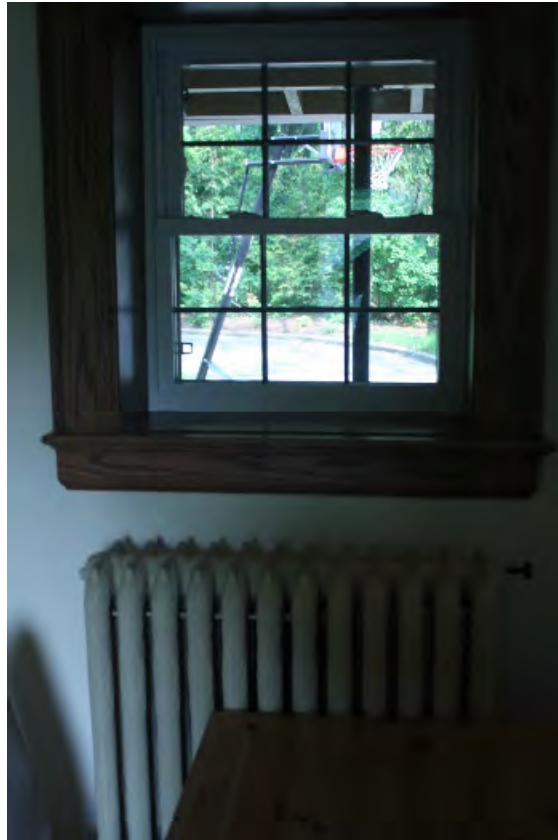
A radiator at 1341 Stavebank Road. (Photo by author.)
